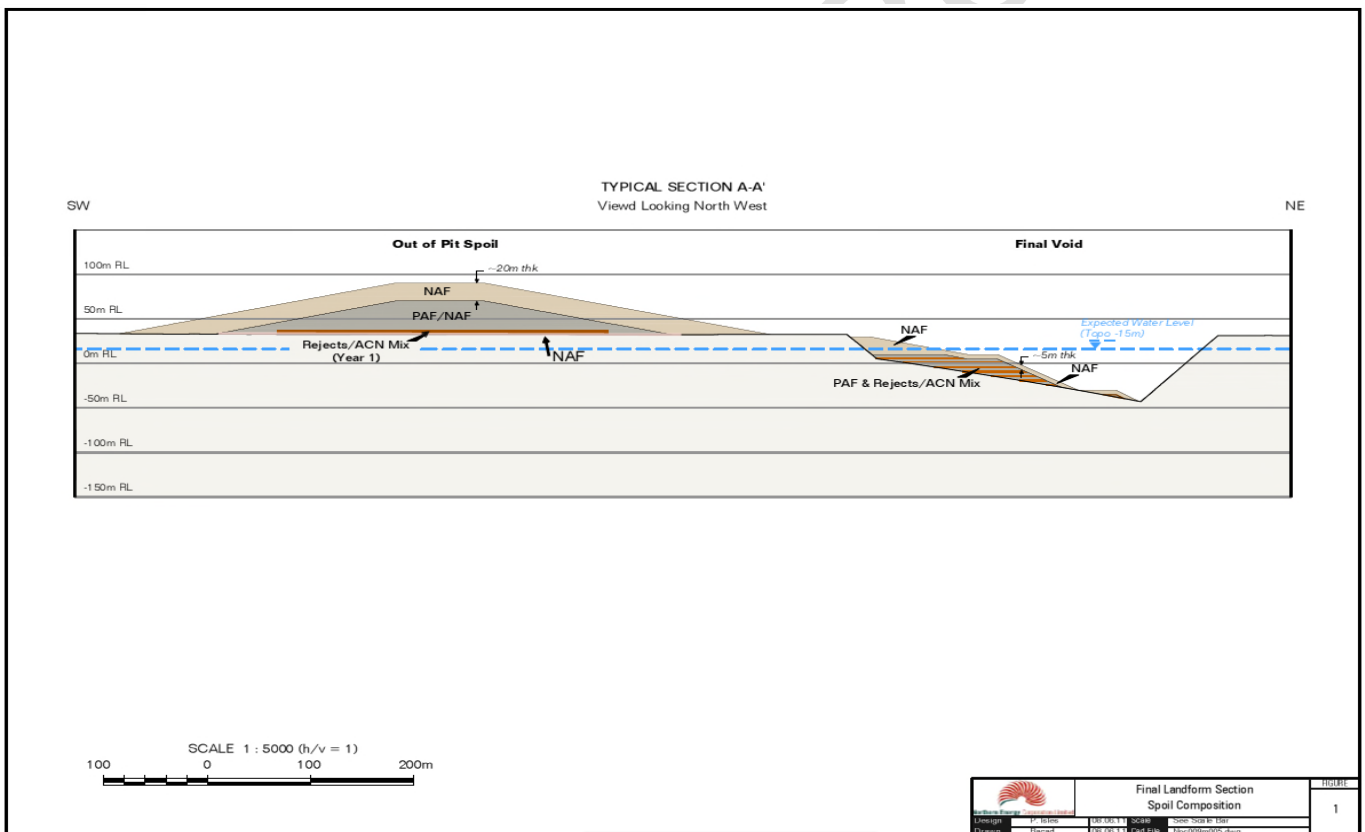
Typical cross section of Final Landform Profile for Pit Void and Out of Pit Spoil Dump (source: Colton Coal EM Plan v3, Figure 44, p181)
